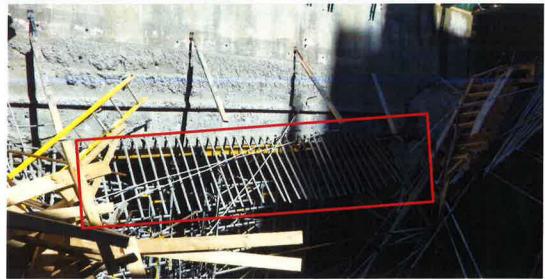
DT02 South Outlet Rebar yielded by failure.
